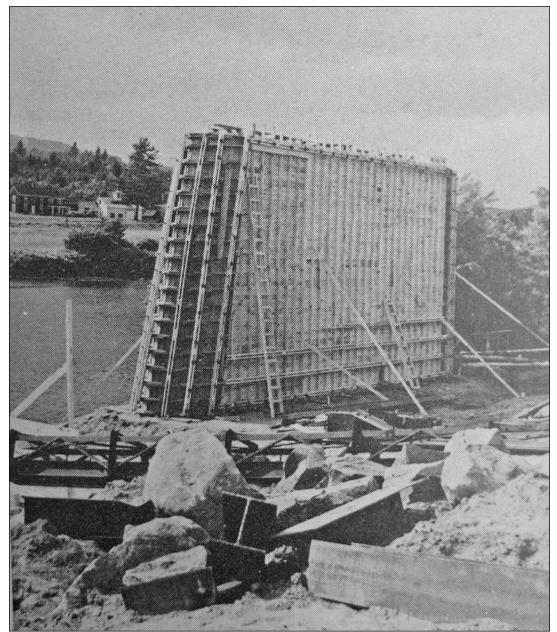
Photograph, July 1950, showing formwork for concrete pier prebuilt on New Hampshire side. The completed form was lifted by a floating crane and lowered into the excavated cofferdam. Source: *New Hampshire Highways*, August 1950.
